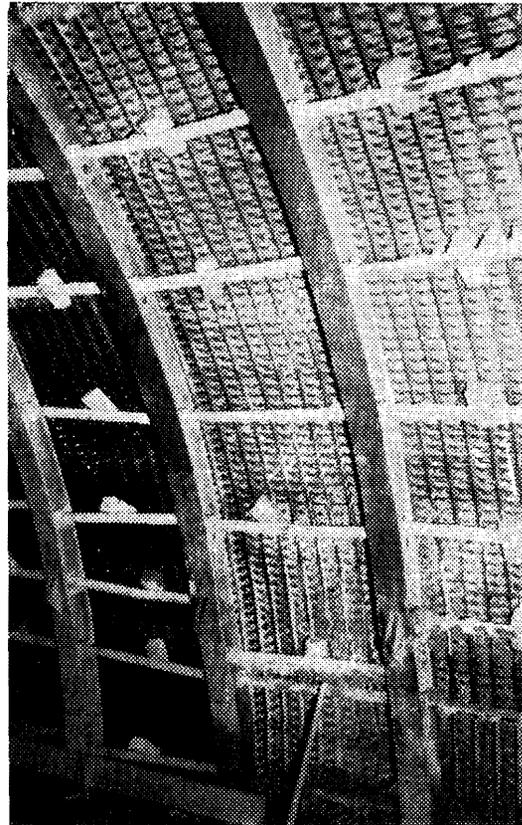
Temporary arches supporting the concrete lining until it has hardened sufficiently to take the loading.
